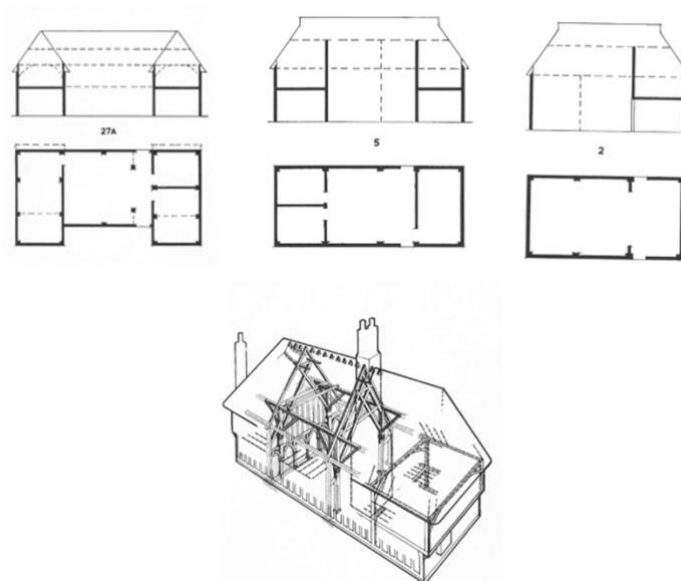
» Timber house construction system, extracted from the book *Framed Buildings of England* by R.T. Manson, 1974.
